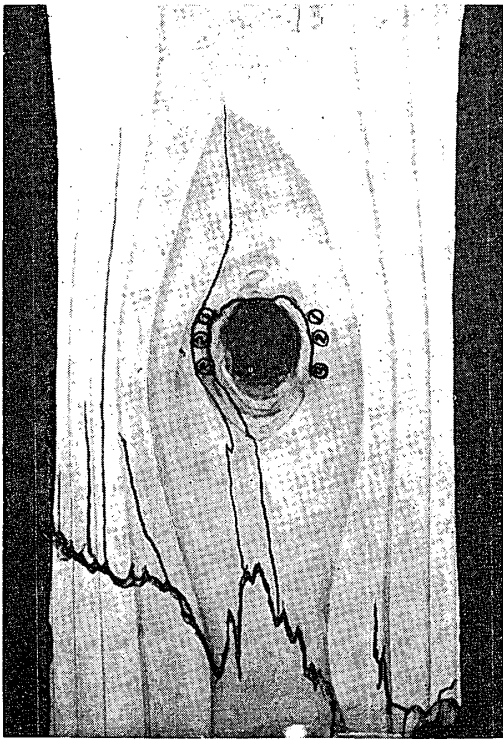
Pith side face of knotty specimen after failure test (Specimen No. 13).
